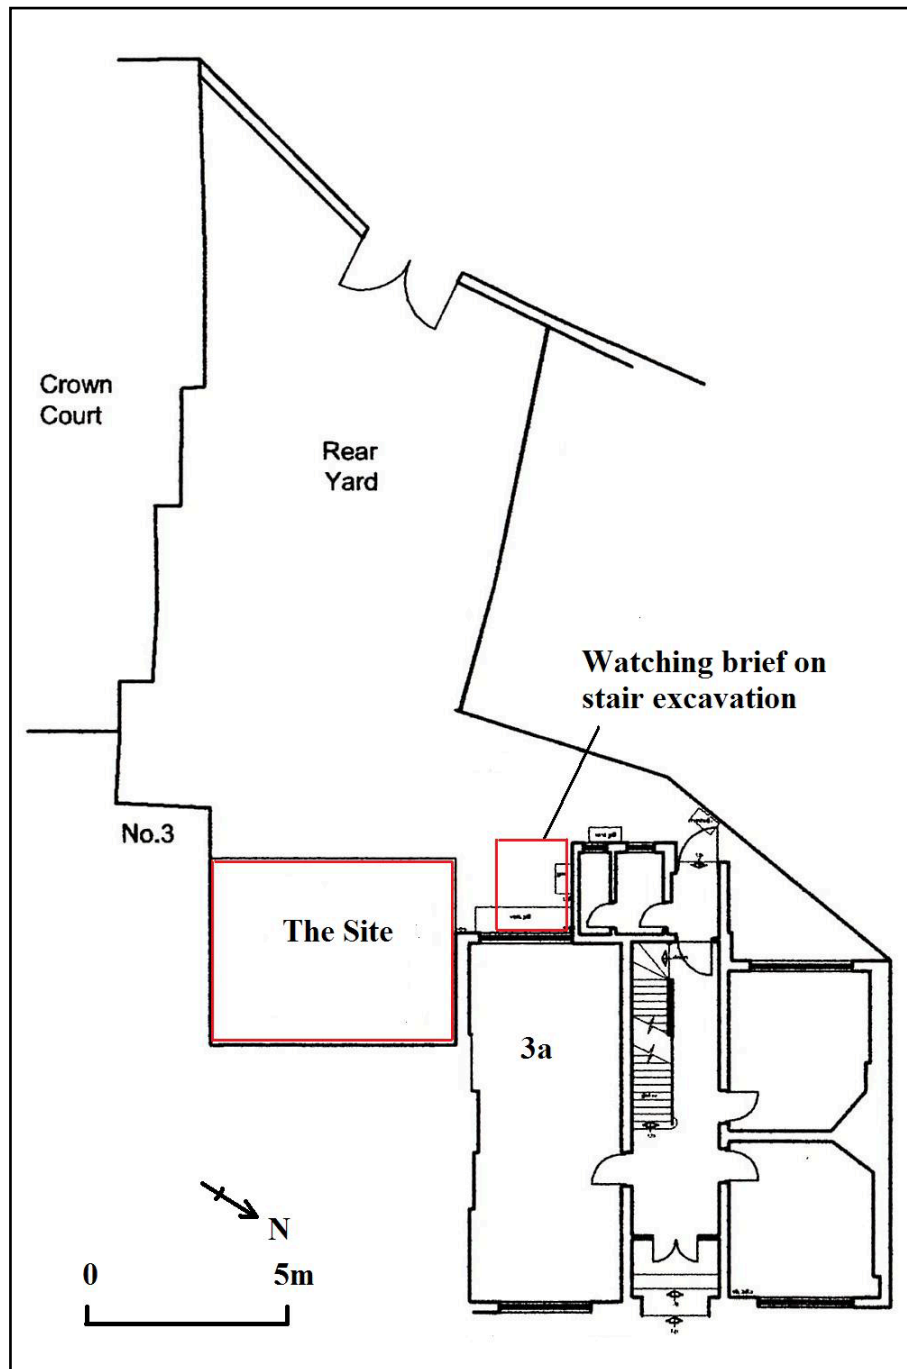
3a Fisher Street, Lewes: Site Plan, showing the location of the main trench and the watching brief on the excavation of the stairs.
